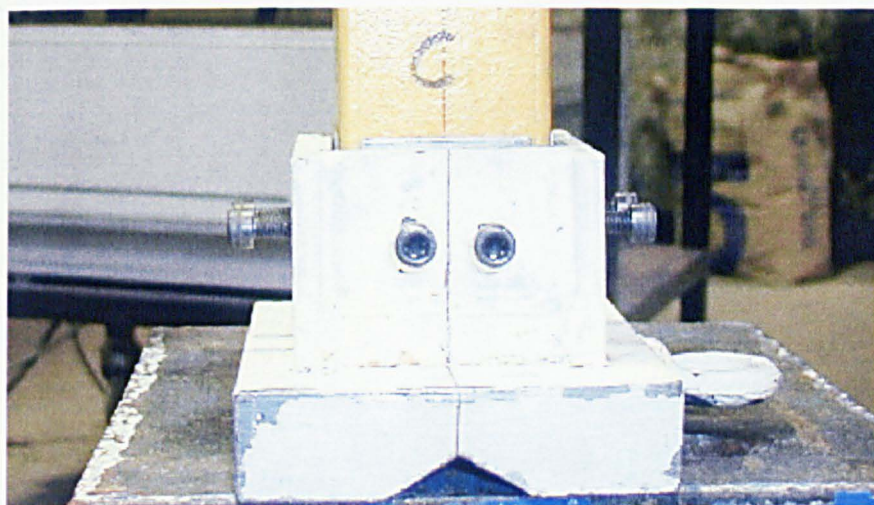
(a) Upper knife-edge, load cell and support assembly and
